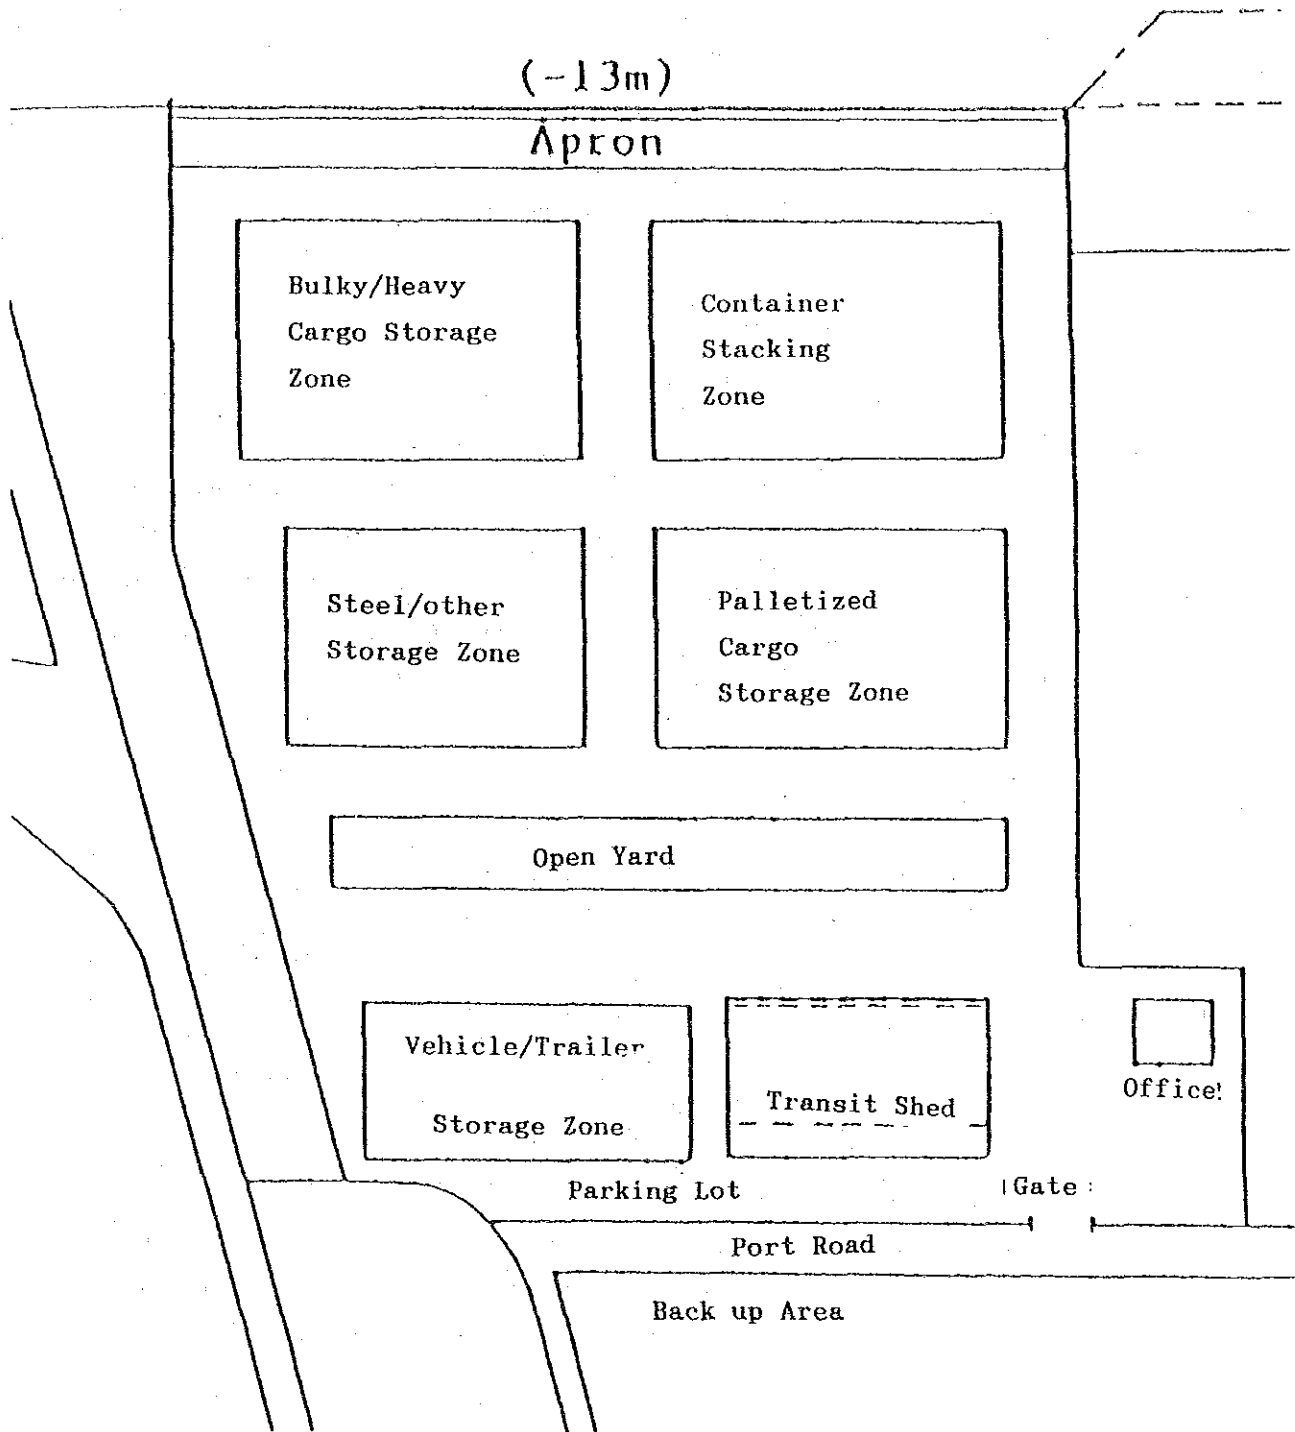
Example Layout Plan of Allocation of Storage Cargo
